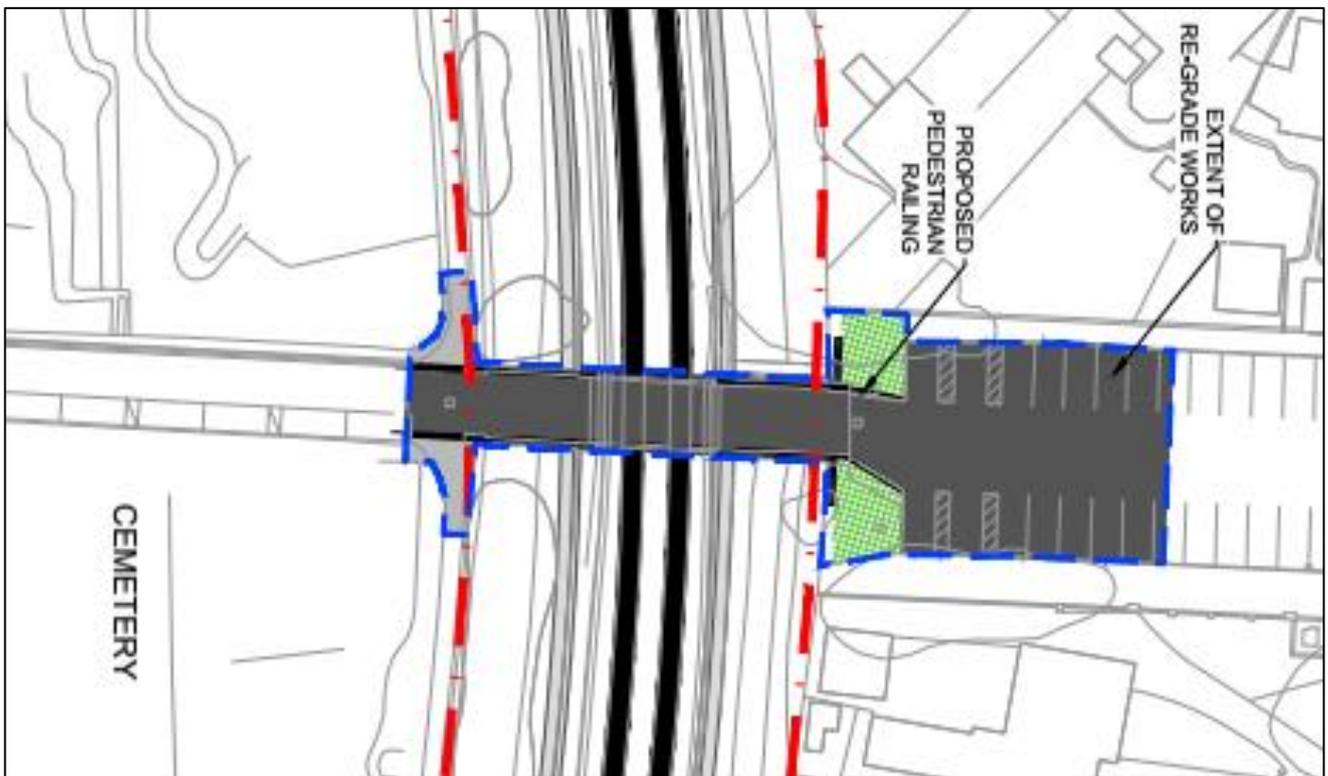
Glasnevin Cemetery Road Bridge (OBO10) Plan – Preferred Option
